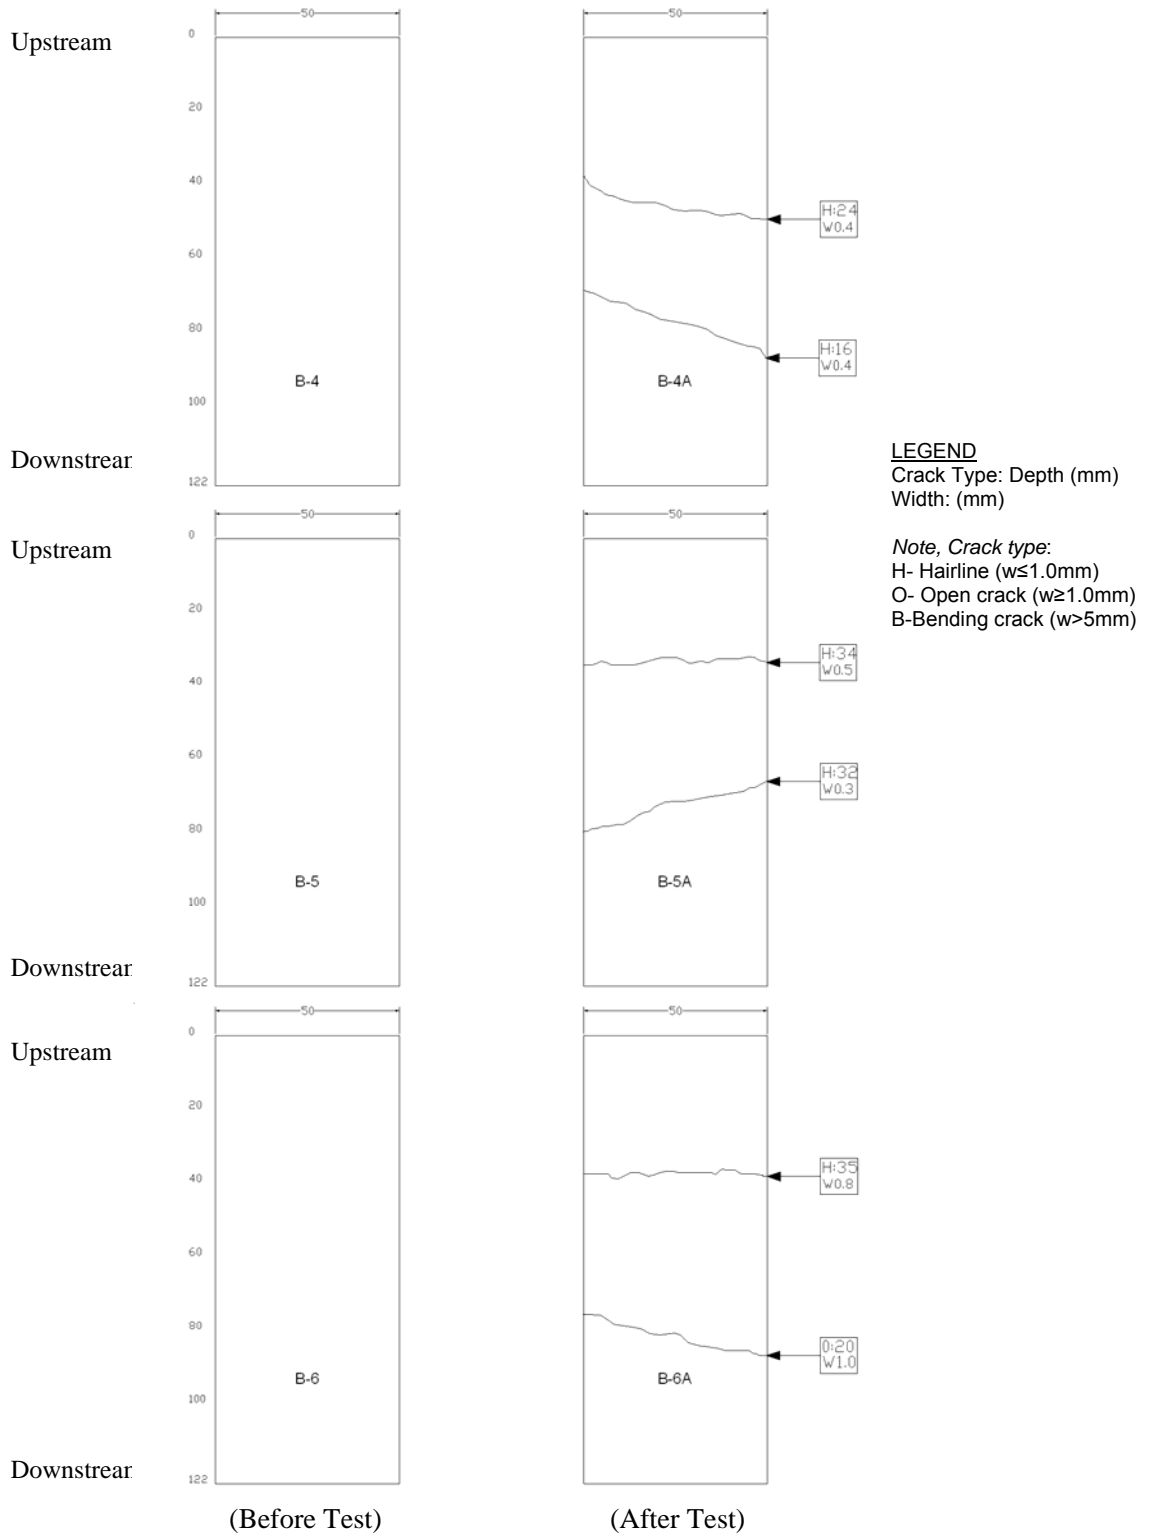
Crack observations-Uncoated concrete slabs B-4, B-5 and B-6
